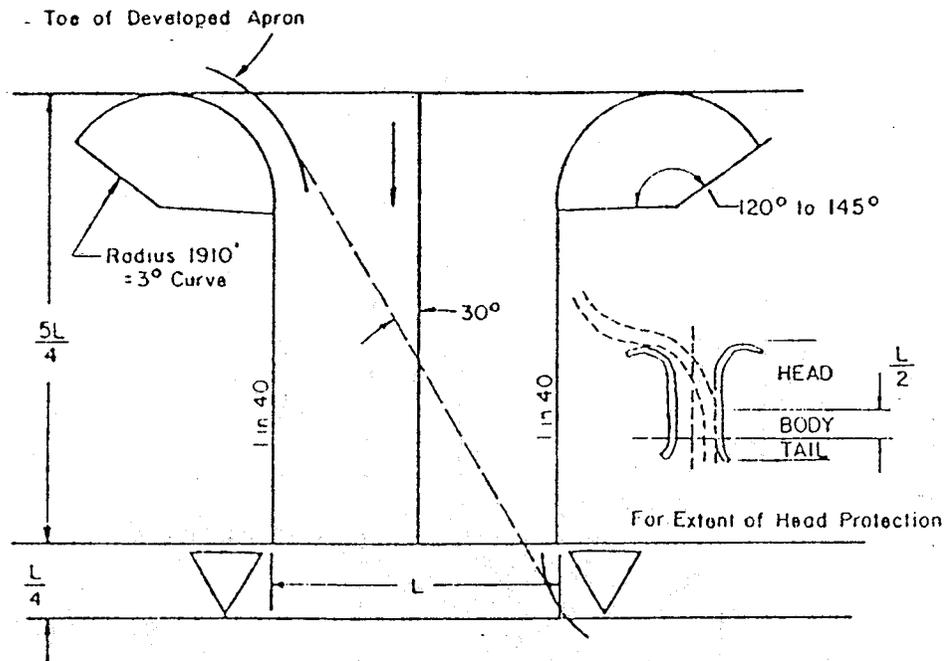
Straight guide bank design to protect bridge from misalignment of the flow.
